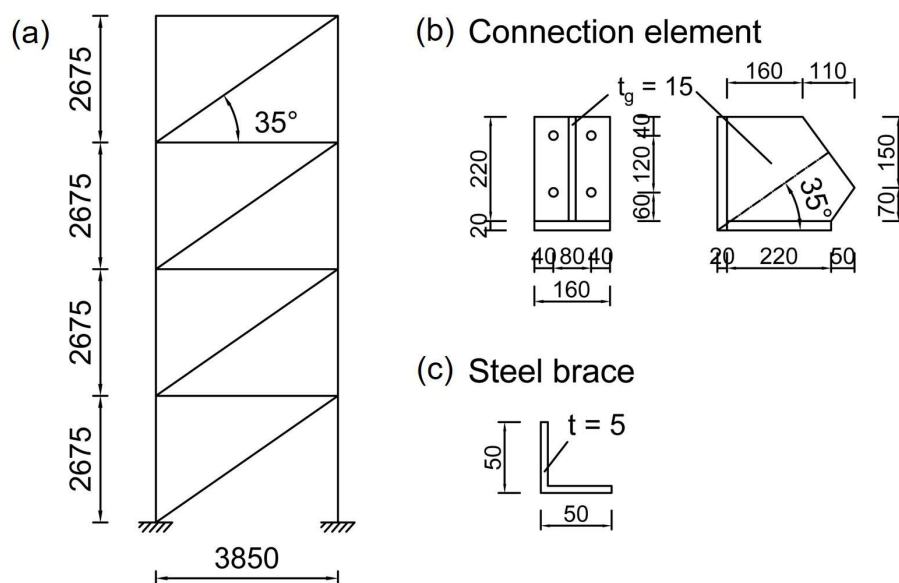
Description of the retrofitted structure. (a) Line diagram, (b) dimensions of the bracket-to-gusset plate connection element, and (c) section of the steel brace. (Note: All dimensions are in mm).
